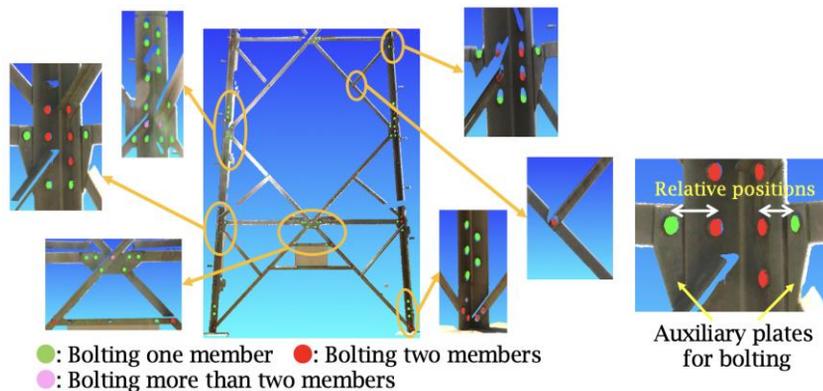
Detected Bolts: (a) Joint types of bolts, and (b) Auxiliary plates for bolting.
